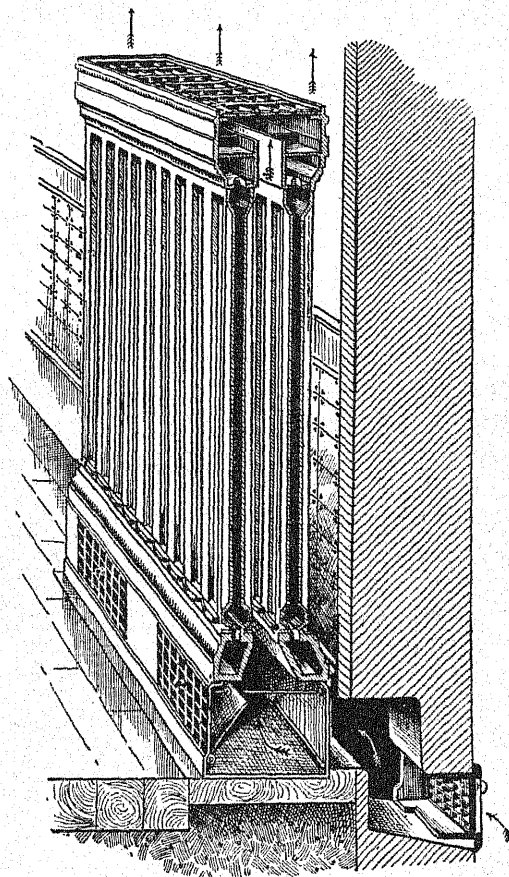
Sectional View of Rosser & Russell's Ventilating Radiator.
